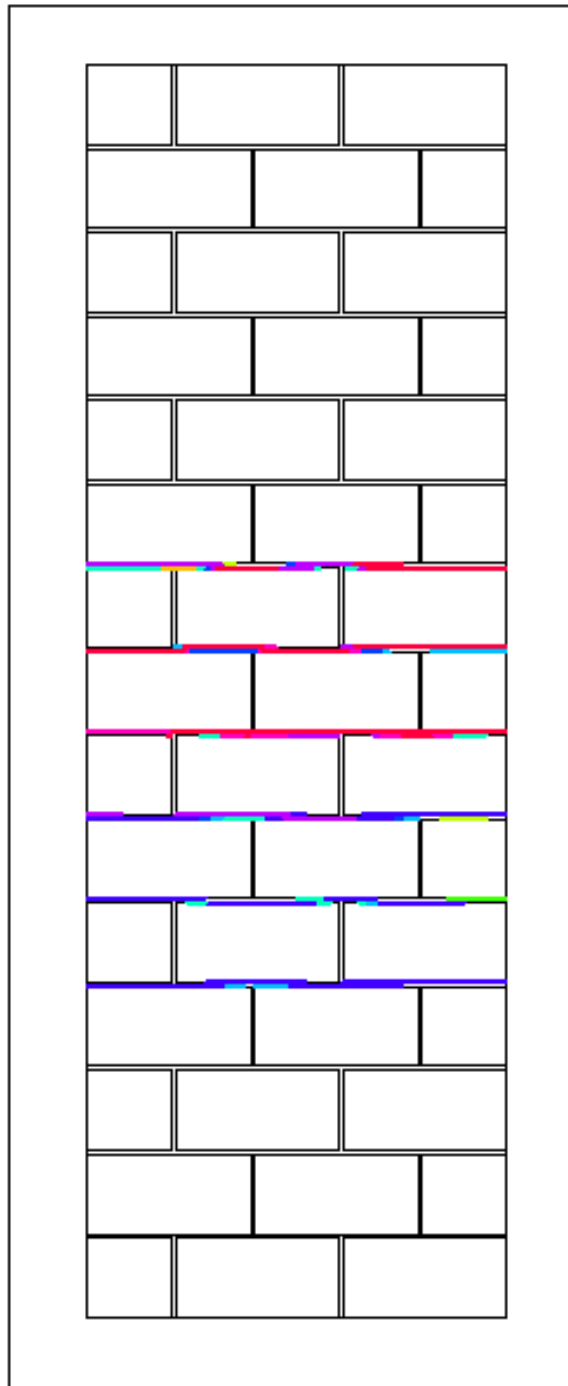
Cracking Pattern of B-2 3m Wall with Rope in All Cells
